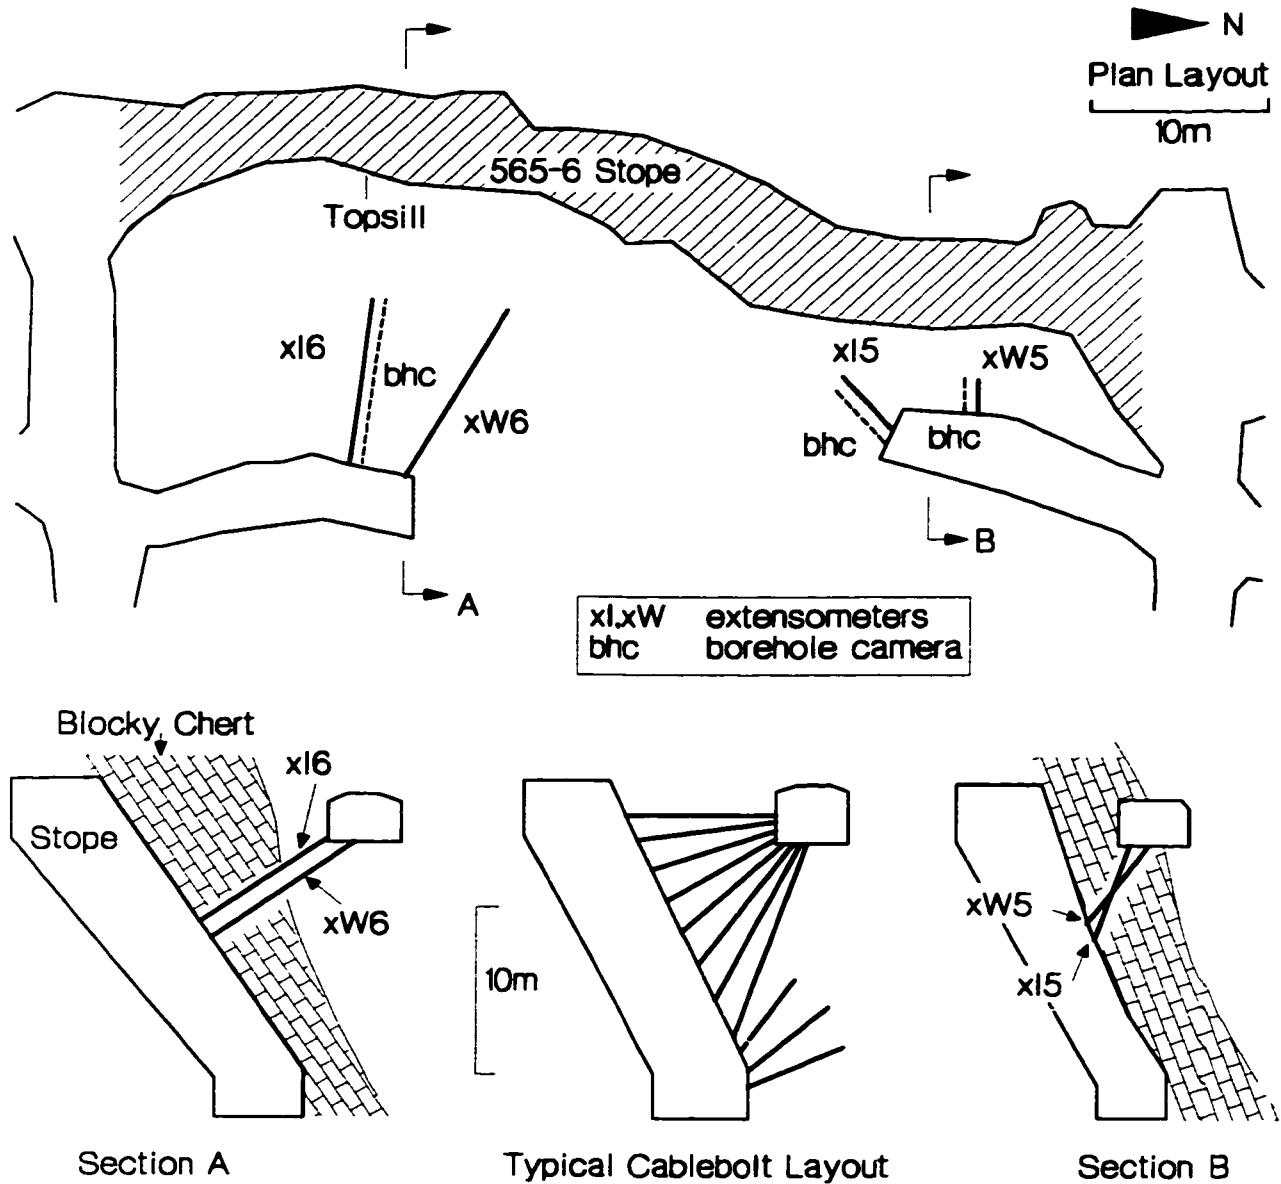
Plan layout and typical cross sections through study area - Winston Lake Mine.
